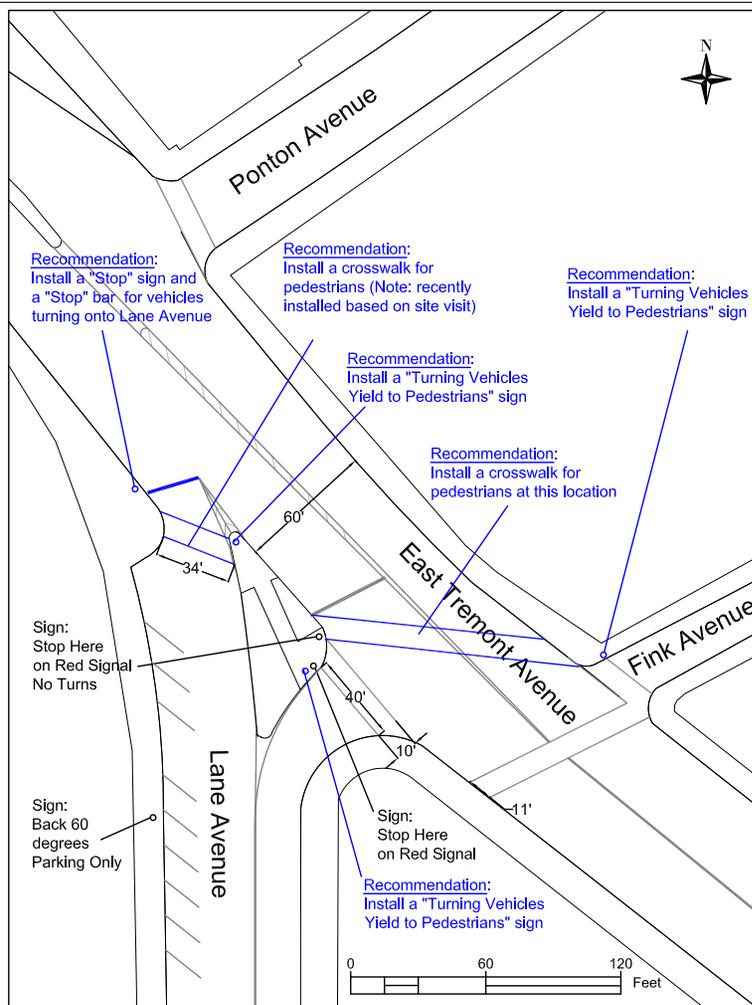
East Tremont Avenue between Fink, Ponton and Lane Avenues (with proposed improvements)
